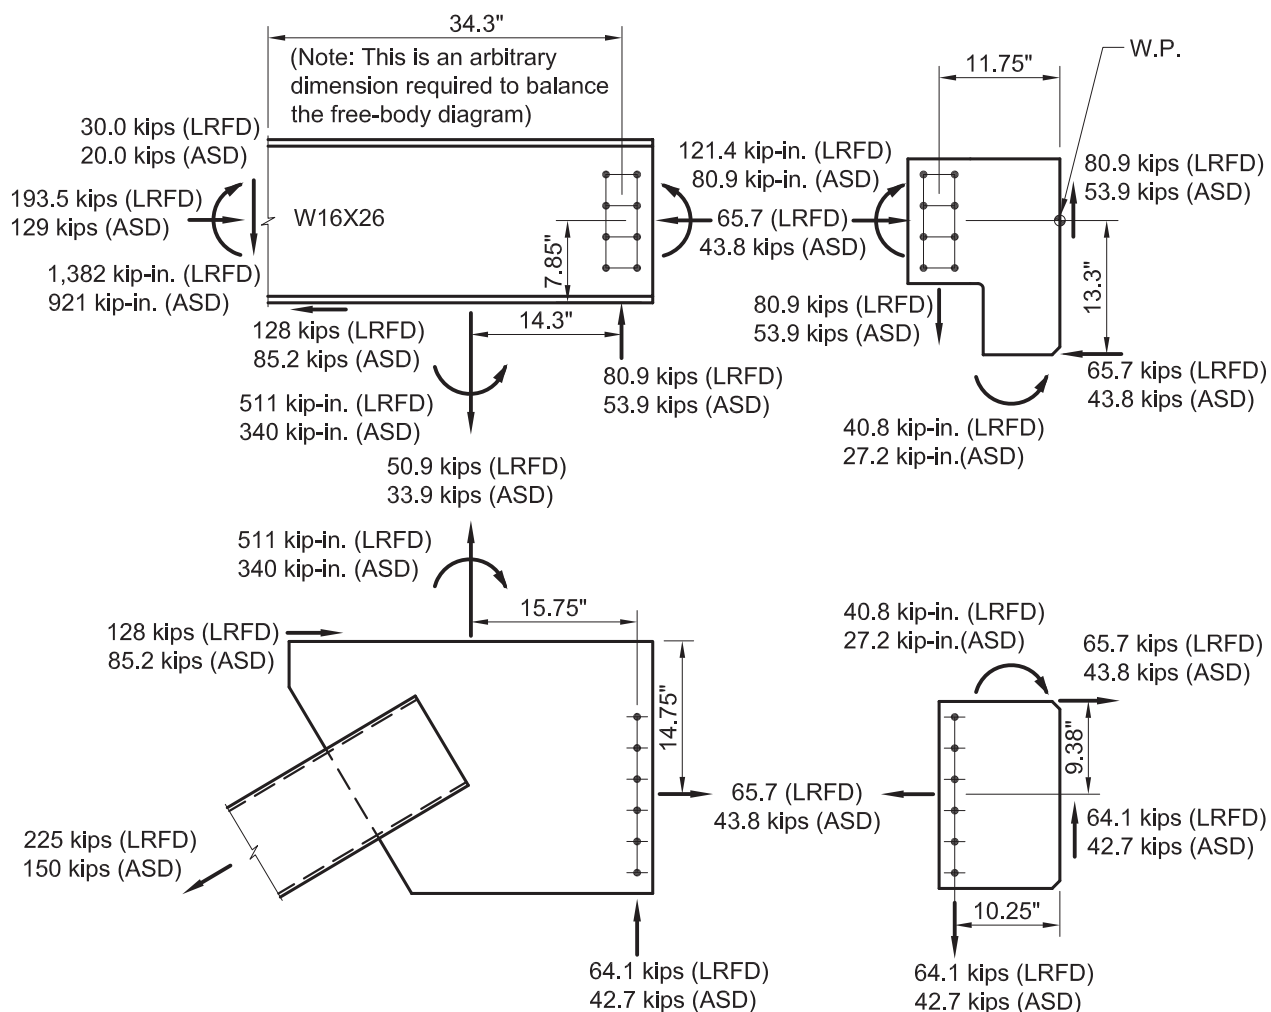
Admissible force field extended single-plate connection example of Figure A-4.
